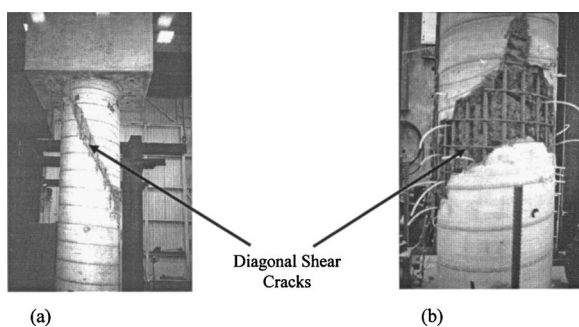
Shear failure of circular as-built columns: (a) Sample CS-A1 and (b) Sample CS-A2
